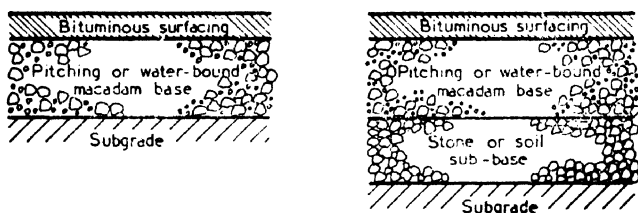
TYPICAL FORMS OF ROAD CONSTRUCTION: BITUMINOUS
